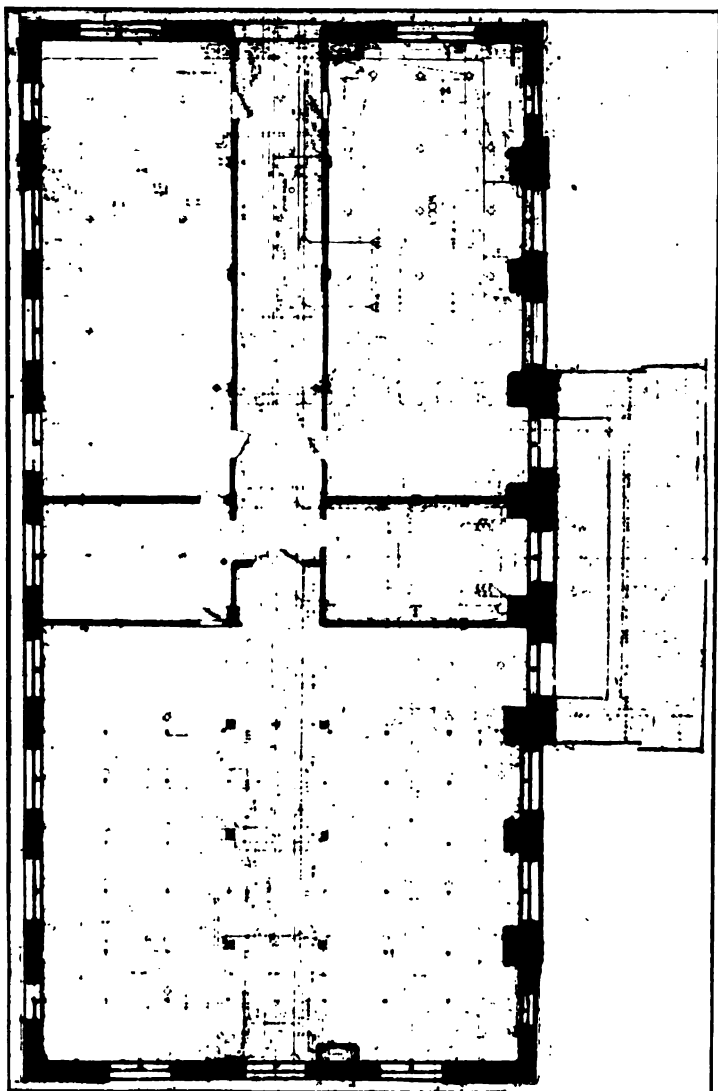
Ground-floor Plan showing Laboratories for Electrical Power Plant Practice and Materials of Construction.
